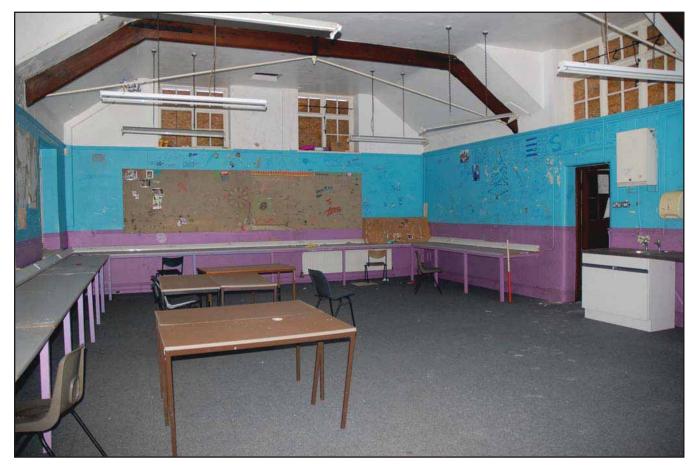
Detached north building Ground Floor Room G01 - north and east elevations
